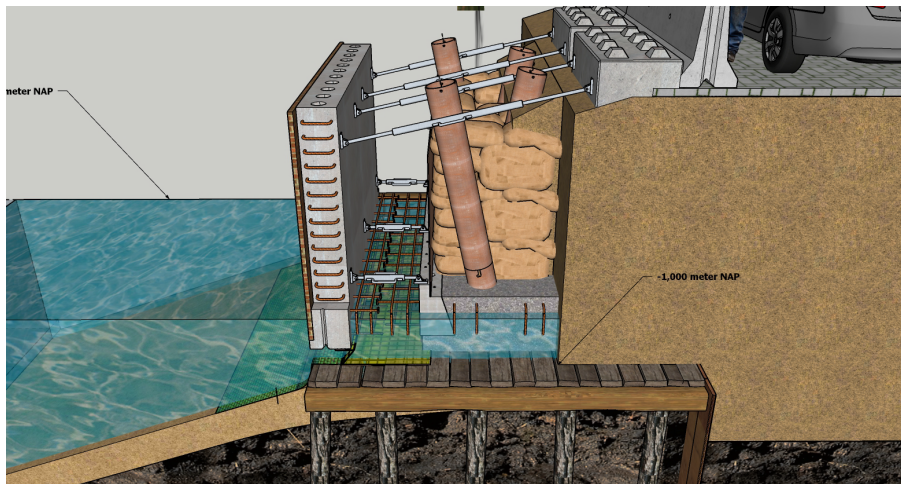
The prefab wall element can then be placed over the piles. [36]
